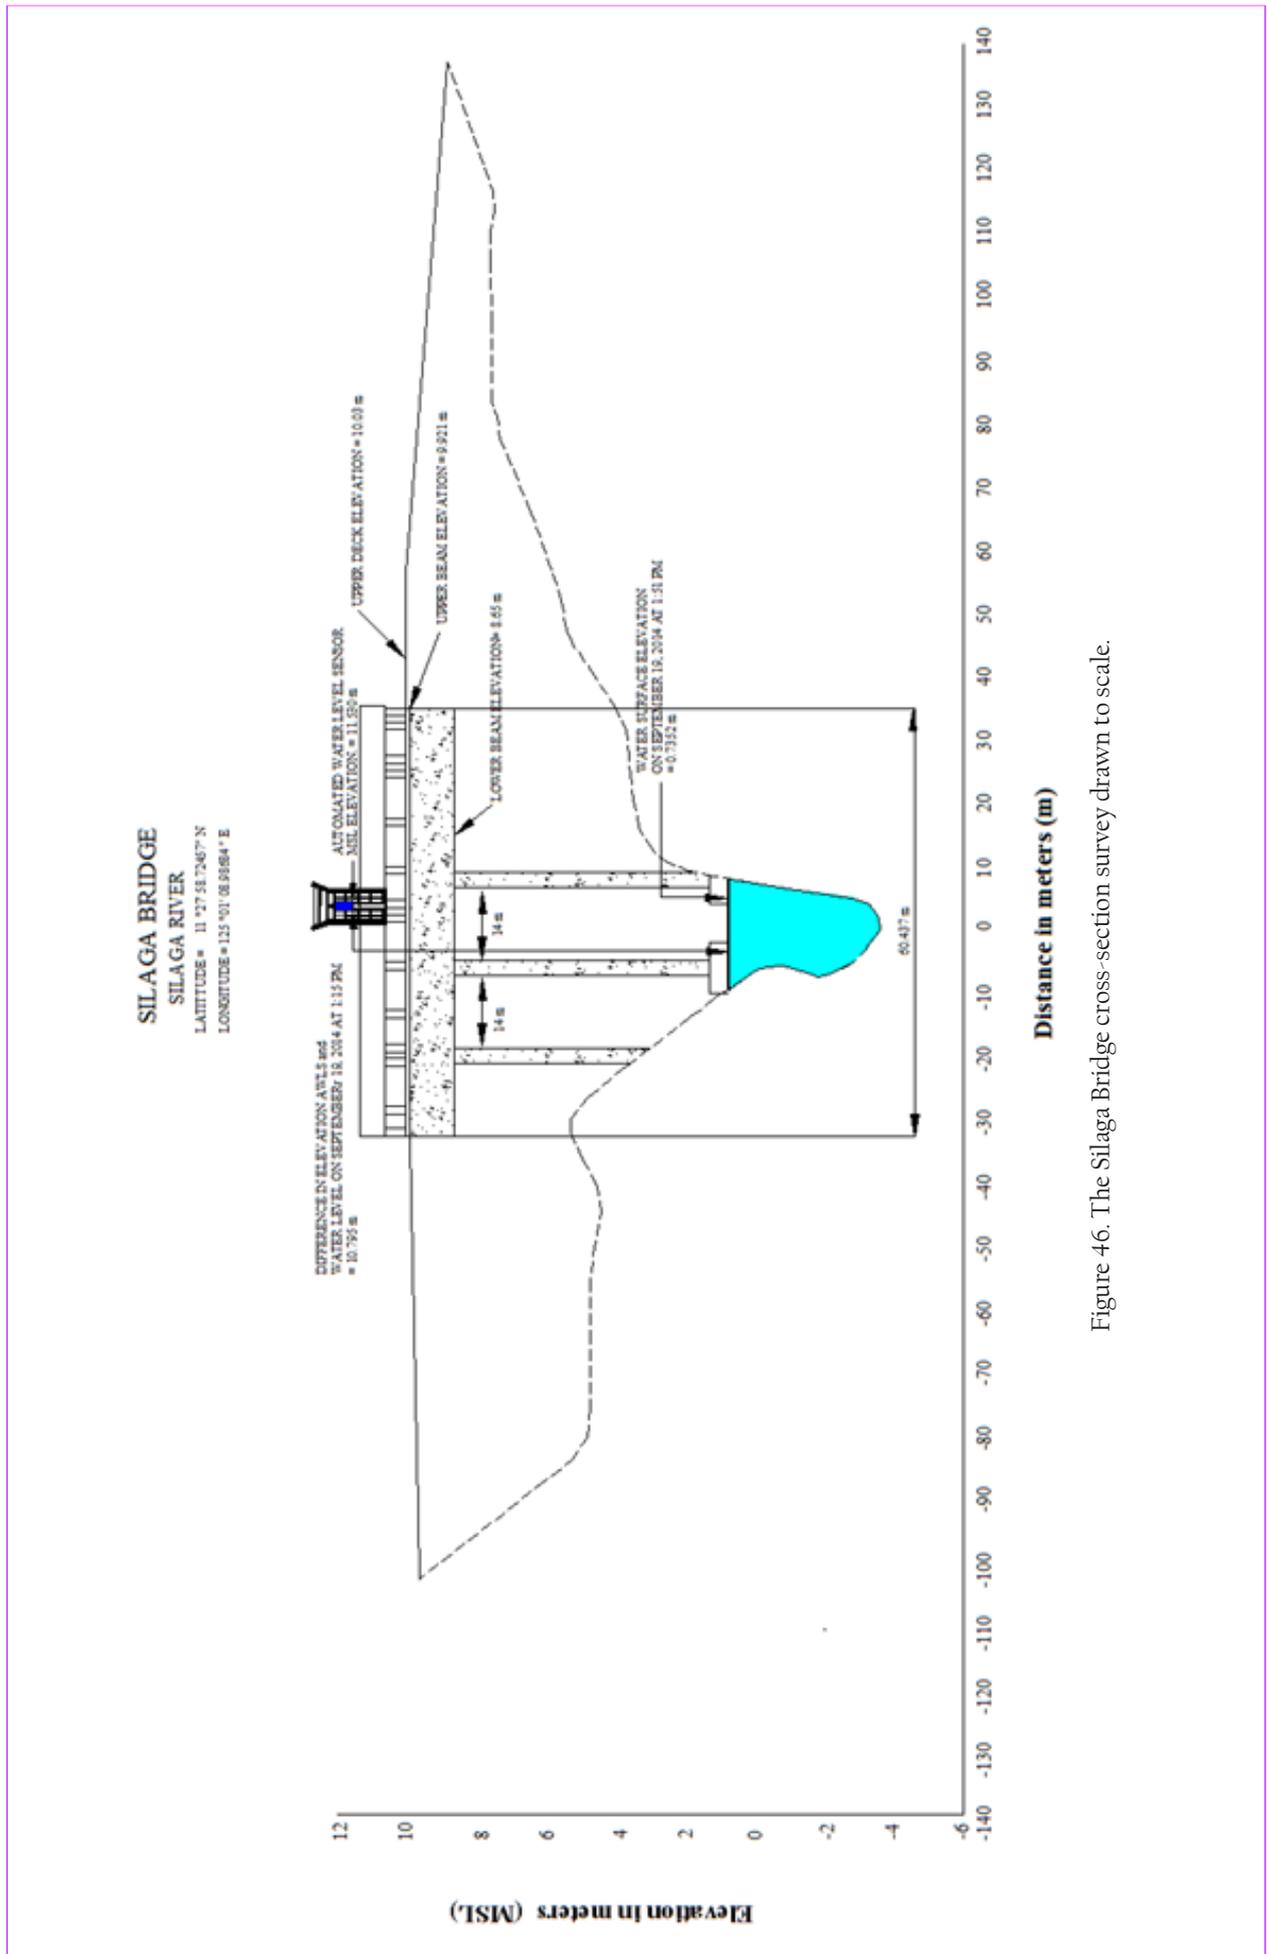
The Silaga Bridge cross-section survey drawn to scale.
